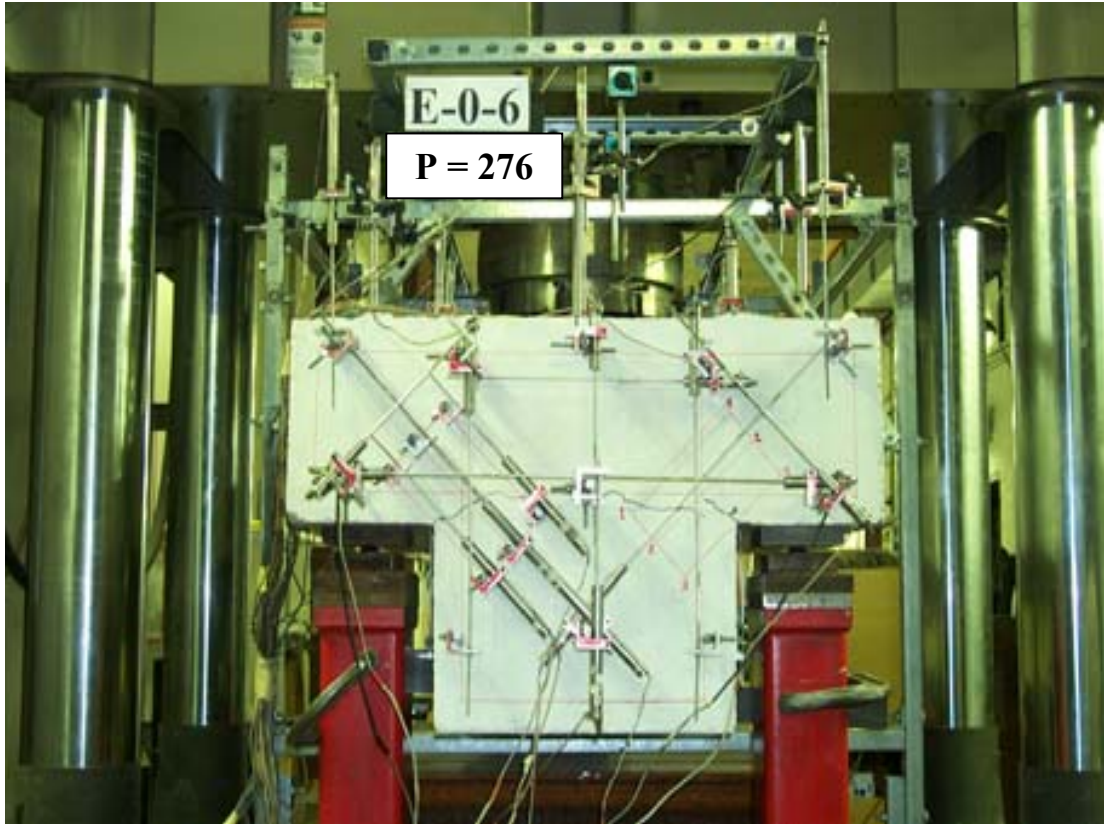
(a) Horizontal cracks in Specimen E-0-6
